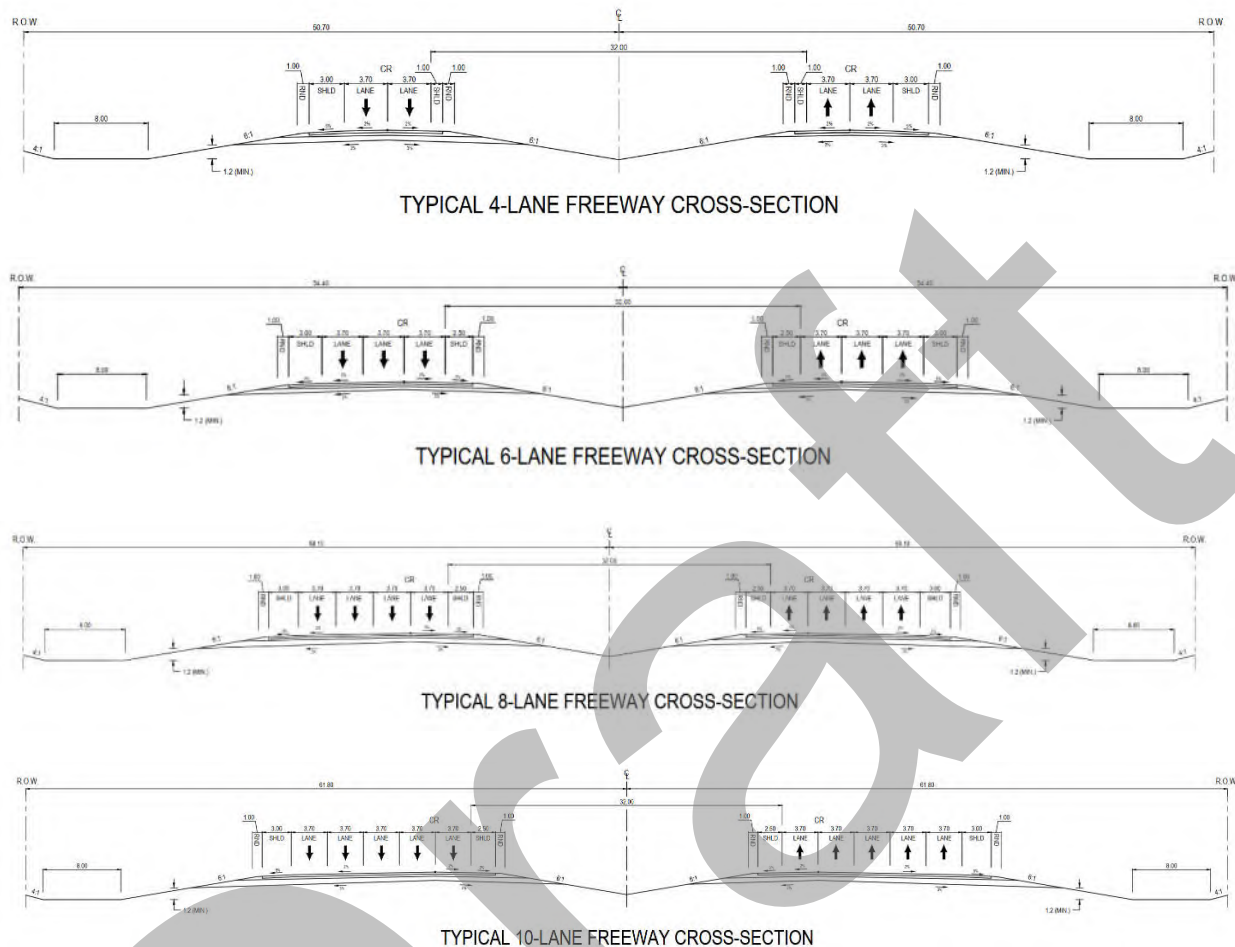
Typical Saskatoon Freeway Cross-Section
